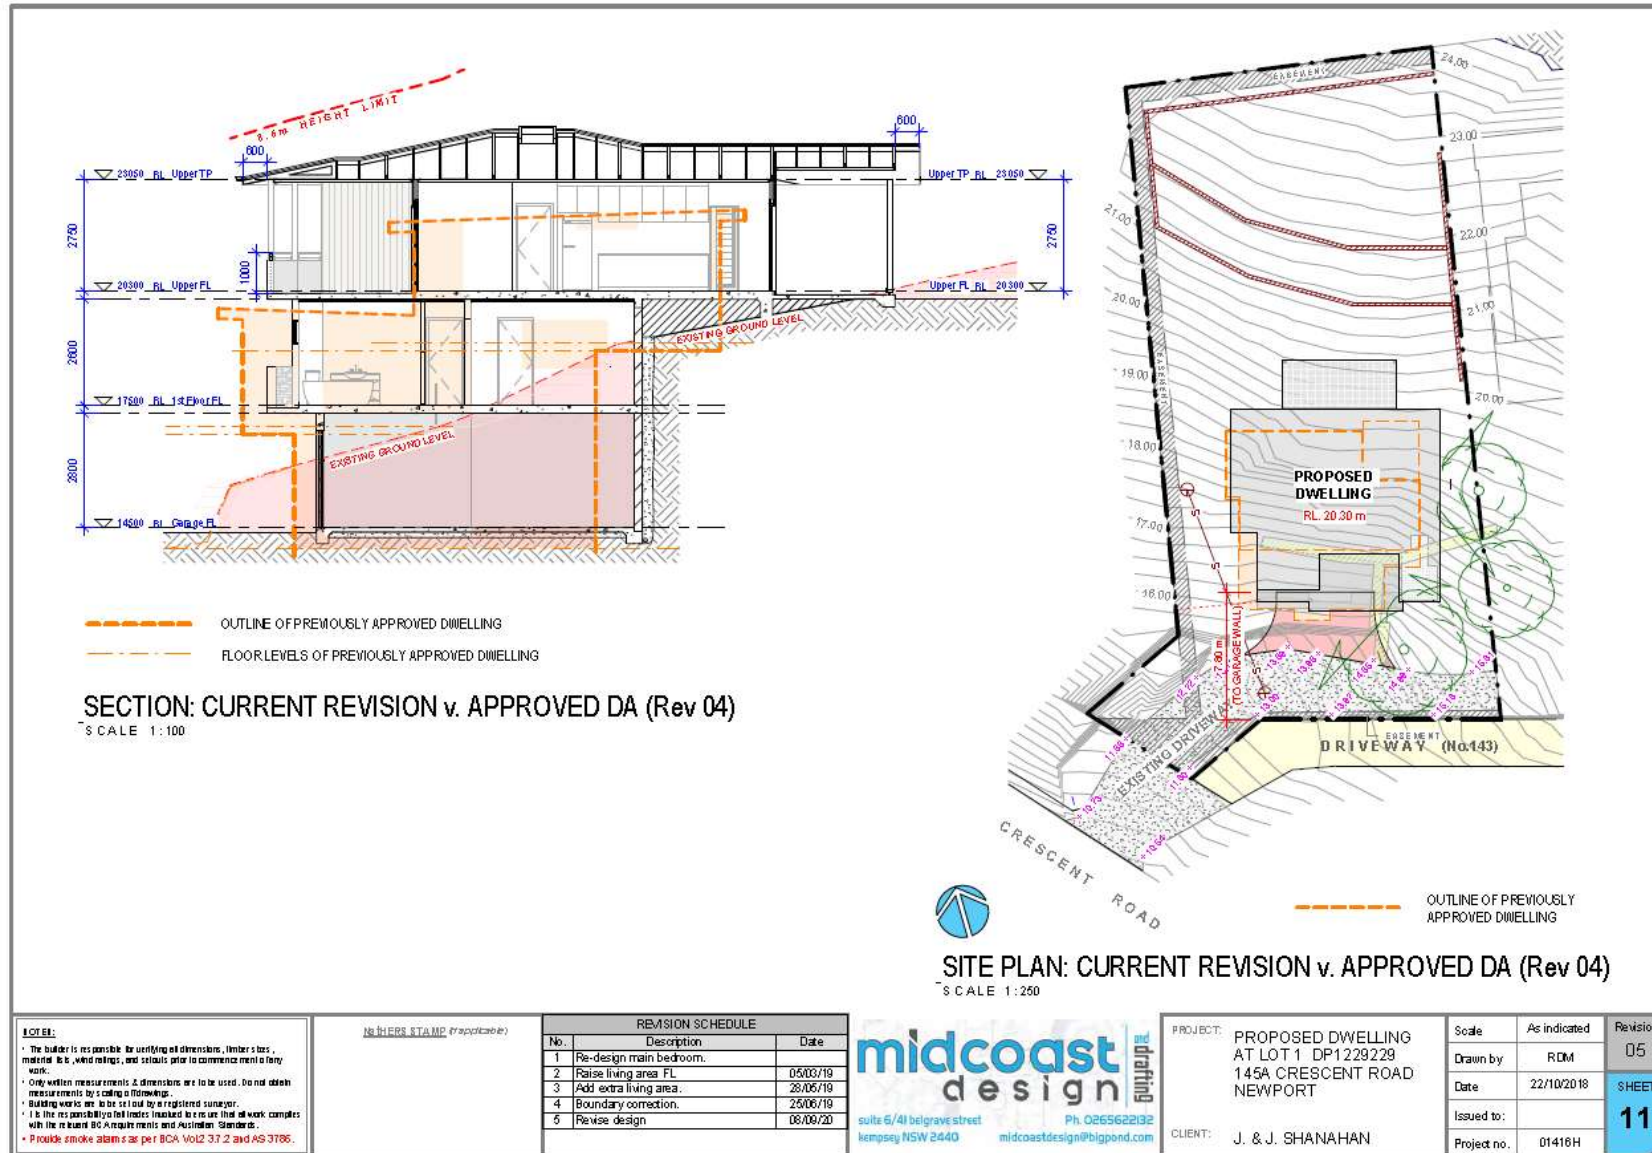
Illustrates the proposed new dwelling Elevations, Section & Perspective images.
